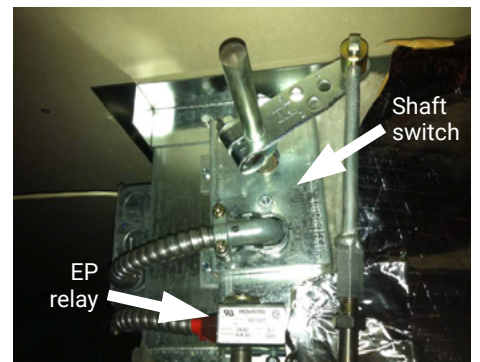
Switch package attached to the damper shaft. It may be reused or a -S model of the Belimo may be installed.
